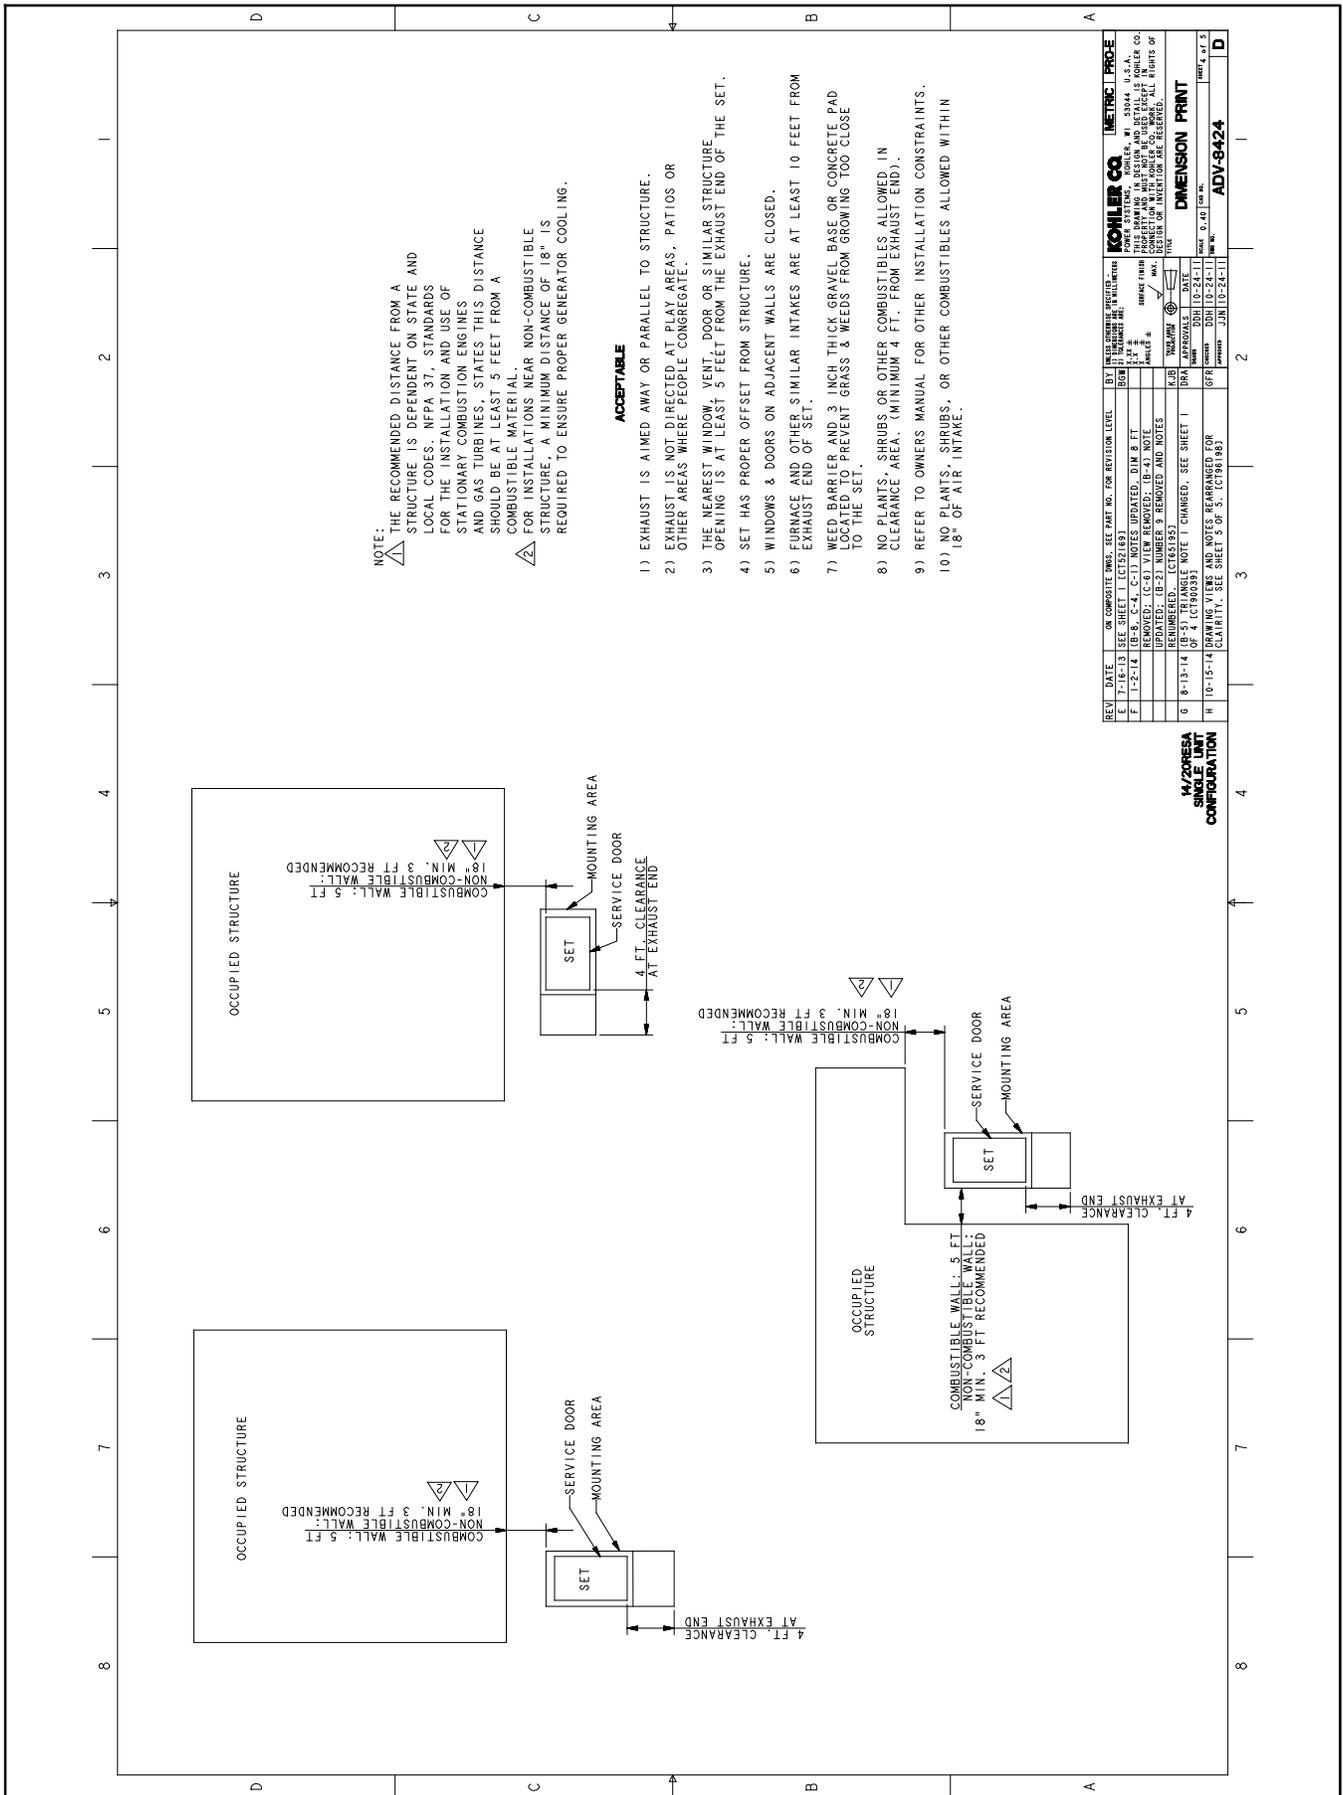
Dimension Drawing, 14/20RESA/RESAL, ADV-8424, Sheet 4 of 5
